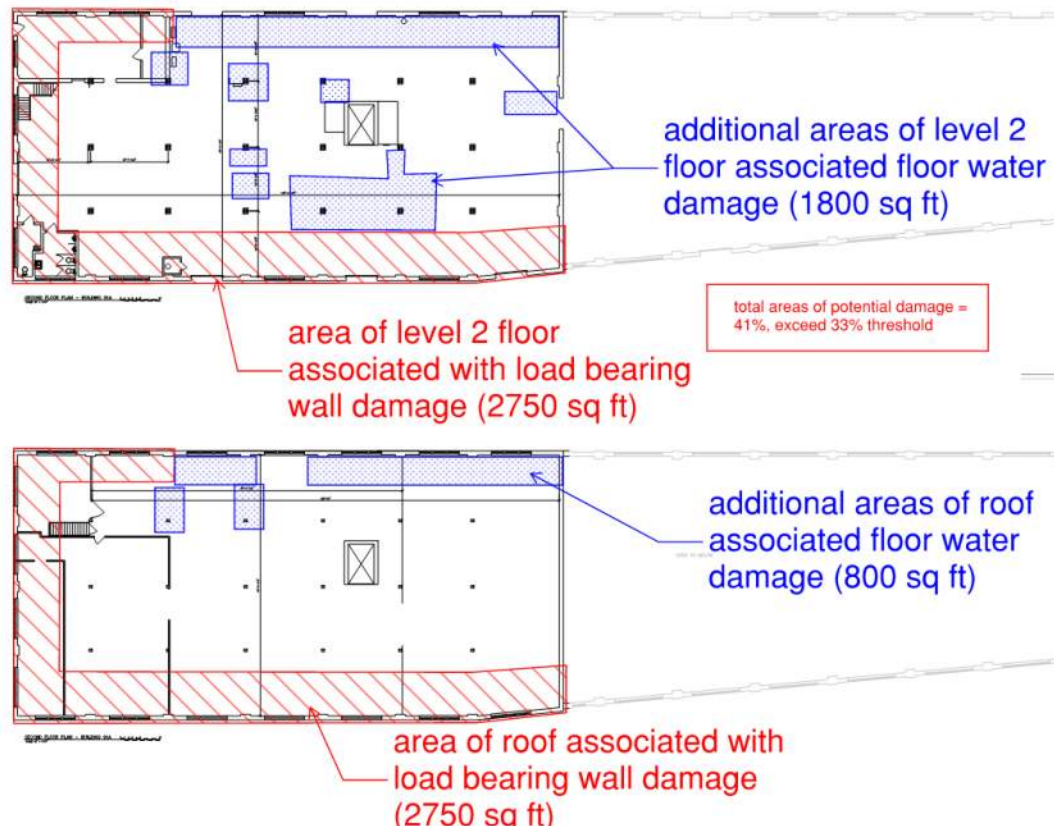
South Building Wall Estimated Effected Areas of Structural Damage – IEBC 2021 (sections 405.2.4 and 405.2.4.1) Compliance Threshold Review.
